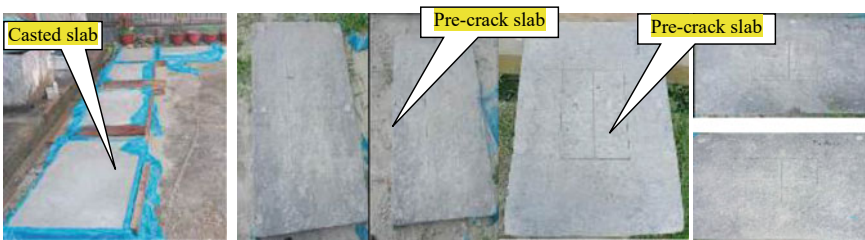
Casted slab specimen, 600 and 750 mm pre-cracked RCC slab specimen 300 × 300, 300 × 375 and 300 × 450 mm pre-cracked RC slab specimen
